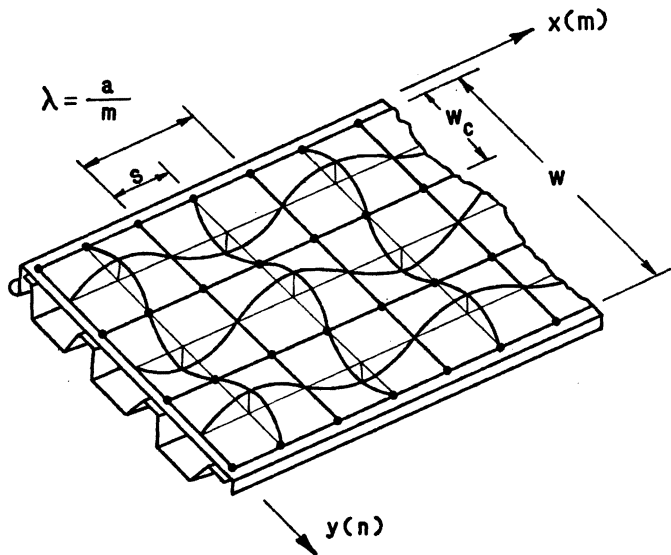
Buckling Configuration of Cover Plate With Adequate Connection Spacing
